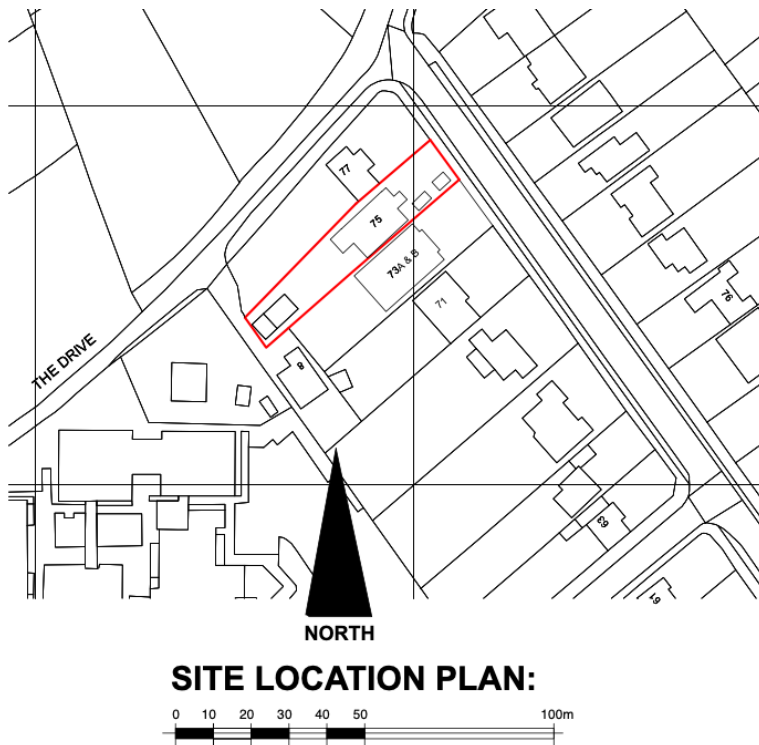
Site location plan. (refer to drawing 1171/P/020)
